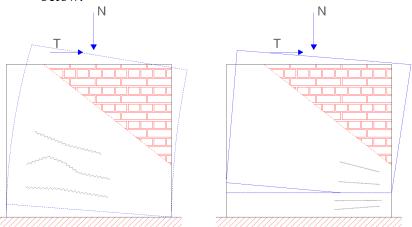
Failure shapes regarding in plane loaded masonry panel, first panel in flexure and second panel in rocking
